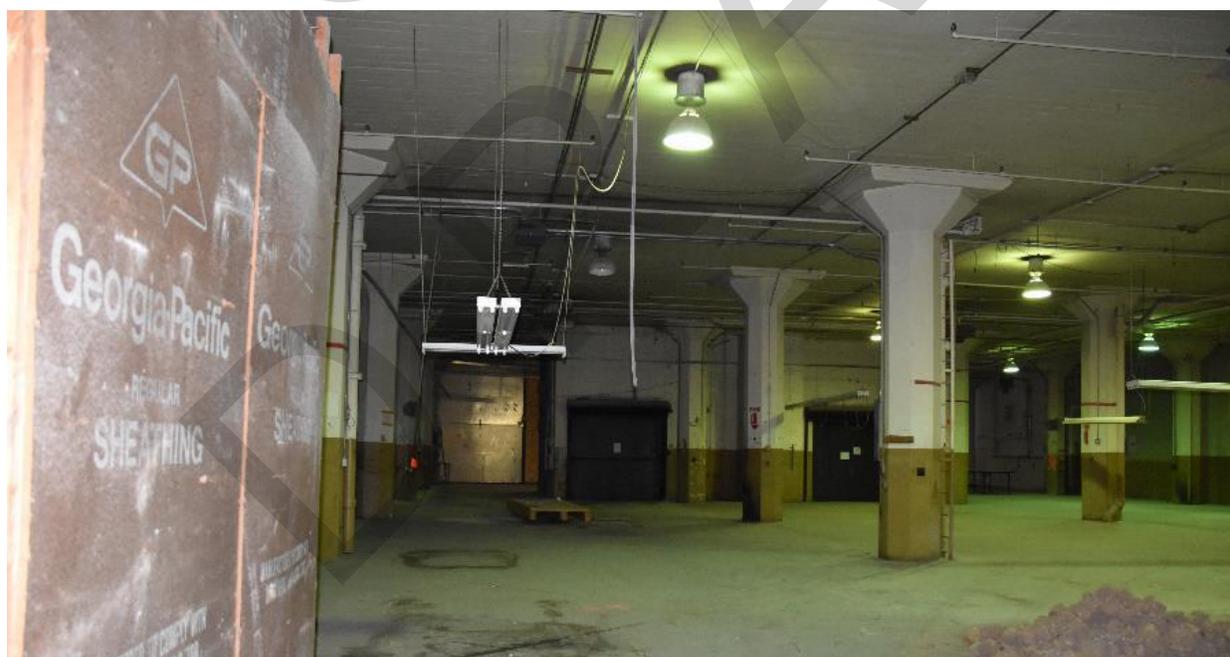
Ford Motor Company Assembly Plant, First subbasement interior
